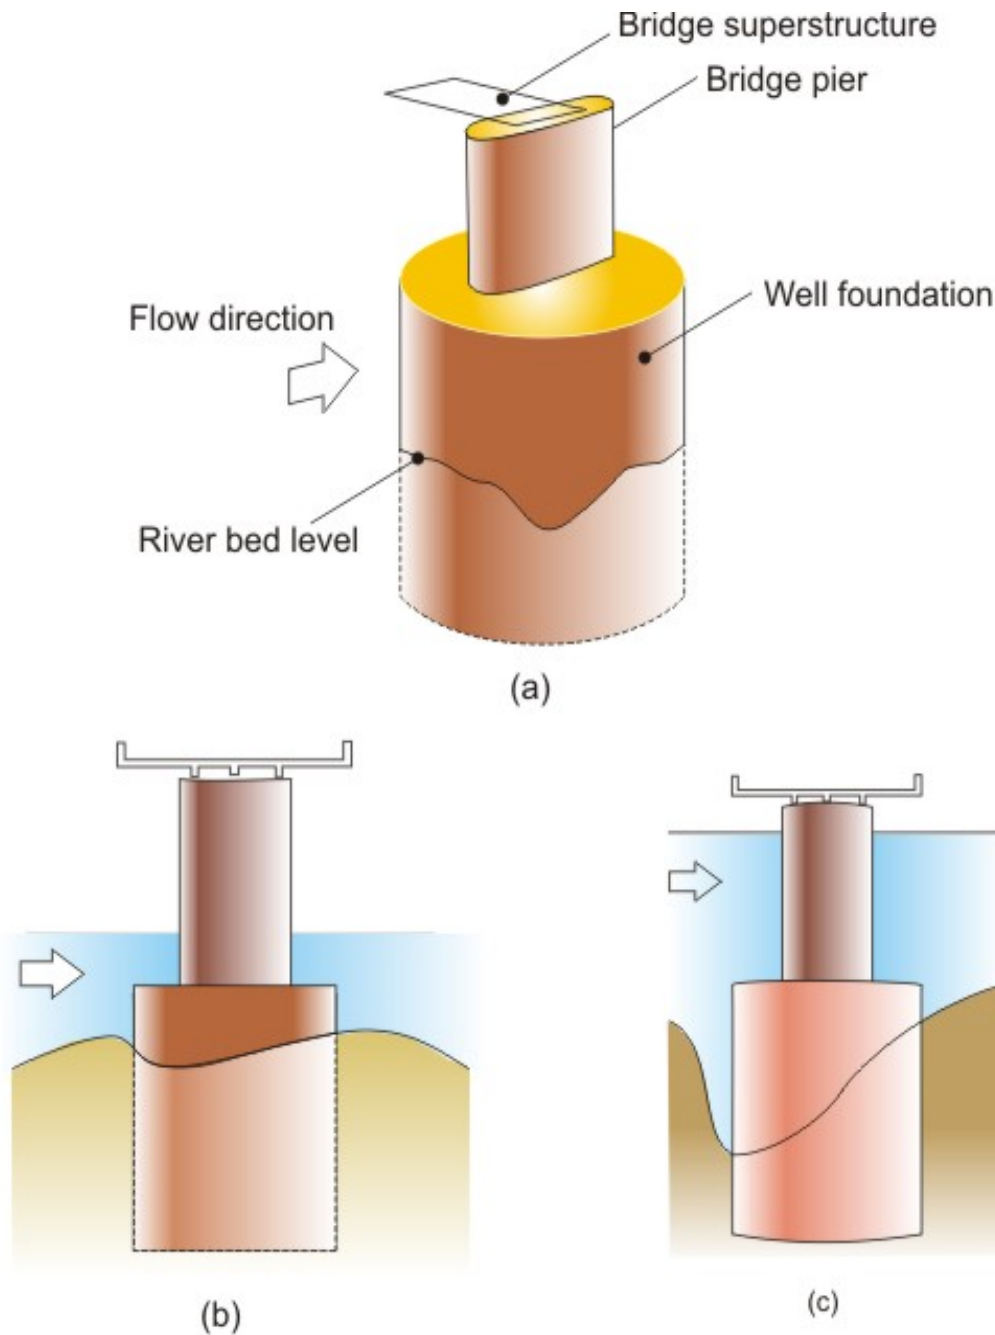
Alluvial riverbed level changes near bridge pier
